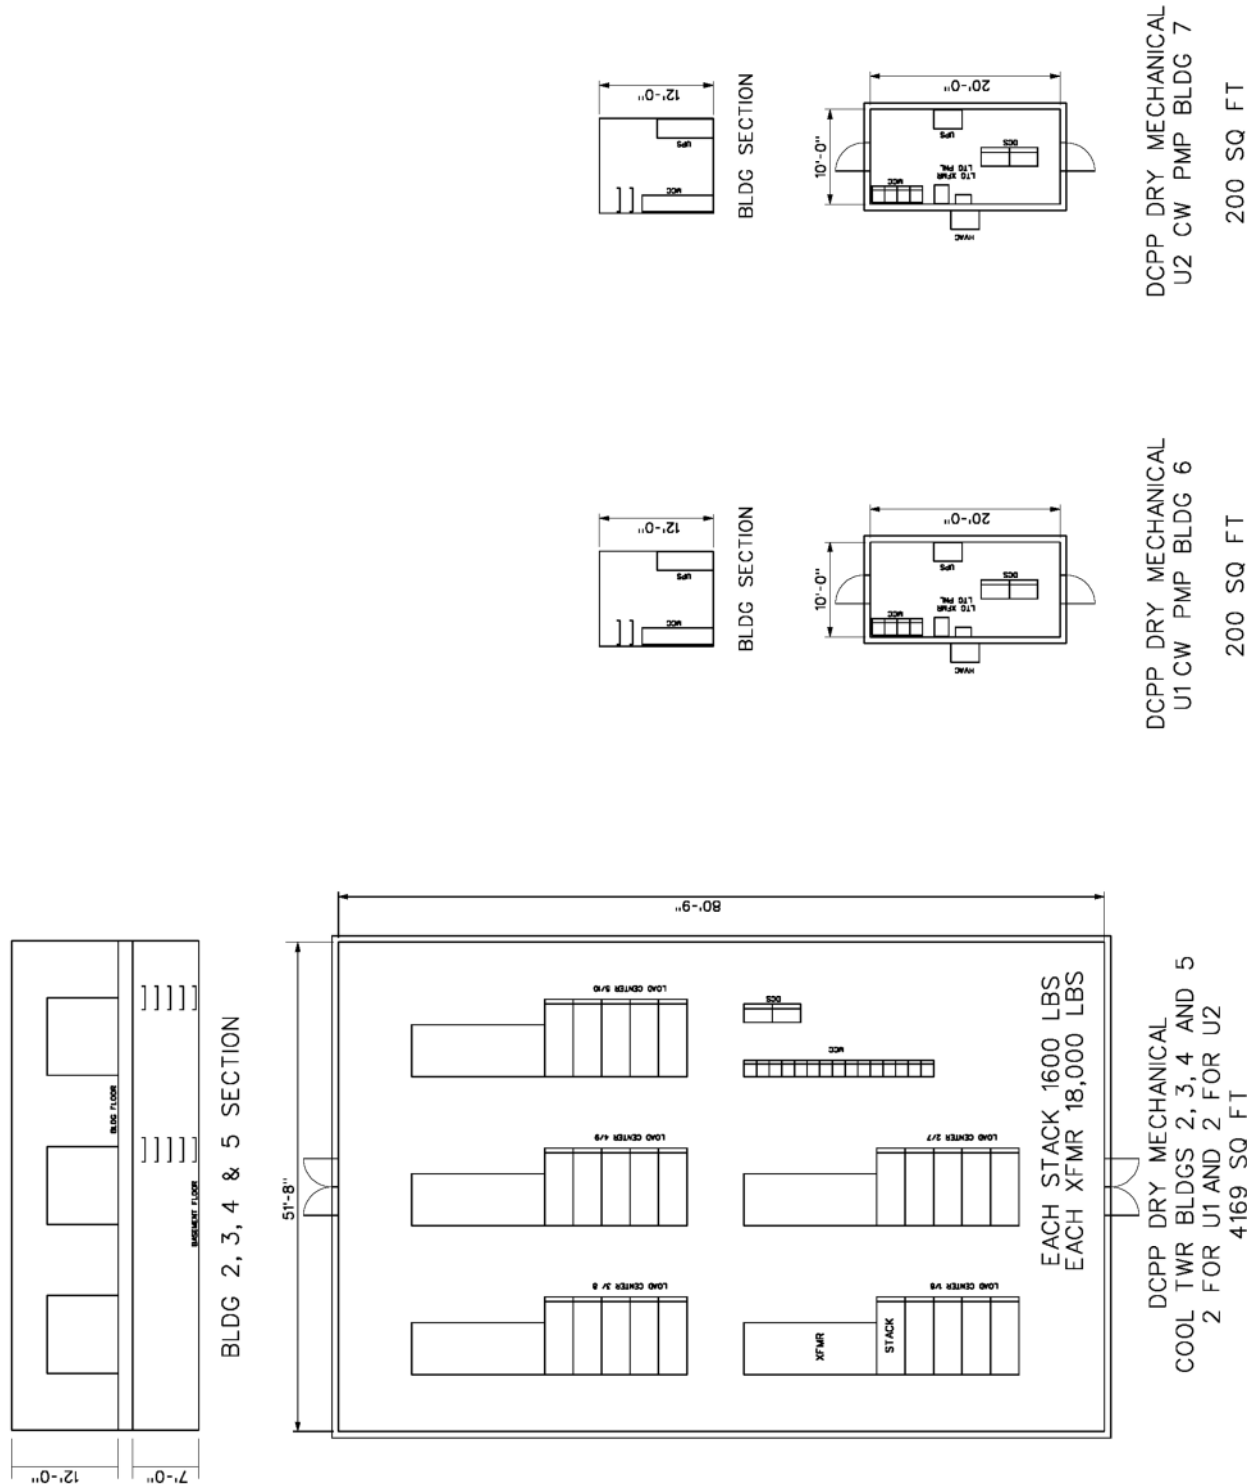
Mechanical (Forced) Draft Dry/Air Cooling—Cooling Tower and Pumphouse Electrical Buildings
